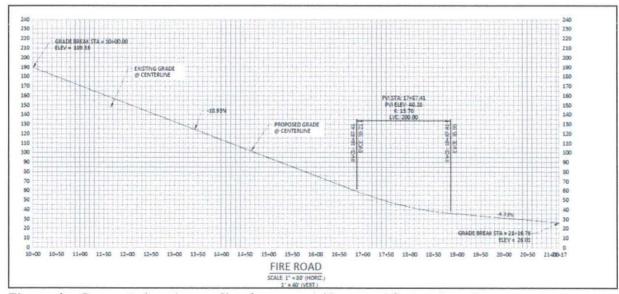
Concept elevation profile of proposed 19 percent fire road grade.
